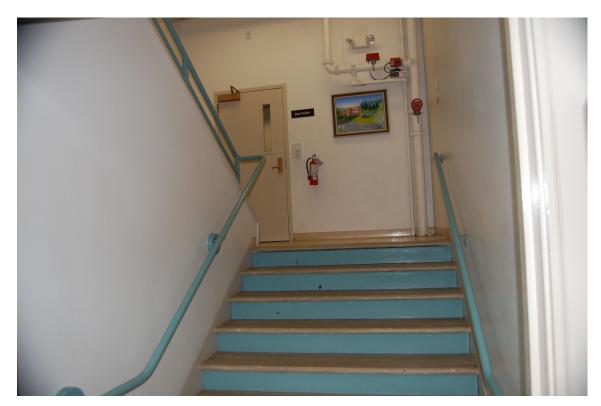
Description: Front stairway in original school. Landing wall dates from 1980s. Direction: W
